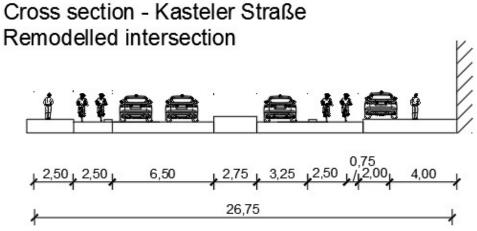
Cross section of the Kasteler Straße (remodelled intersection)
